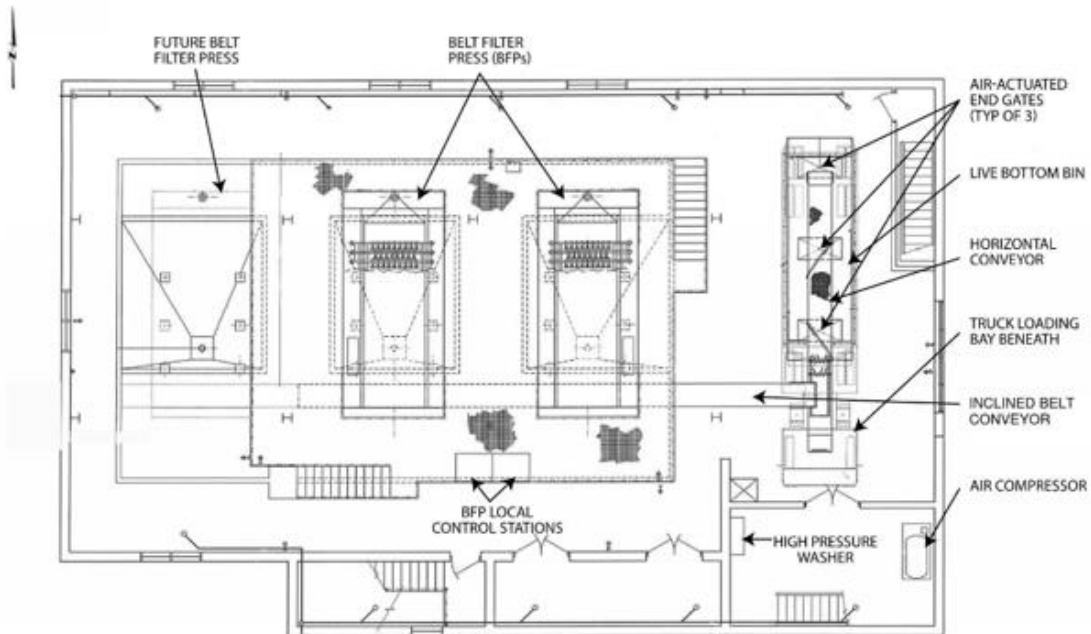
CWSID WRF Solids Dewatering Building - Second Floor
